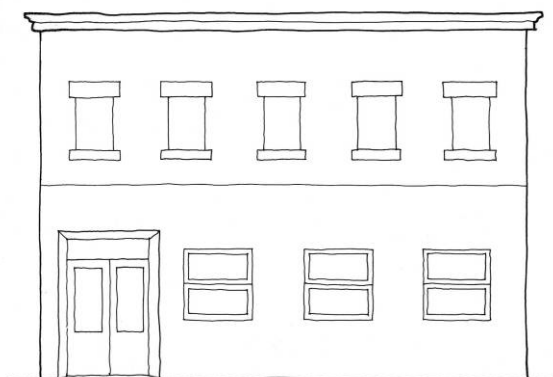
The windows on the ground floor are too small. The shape and style of these windows are not in keeping with the building style.
